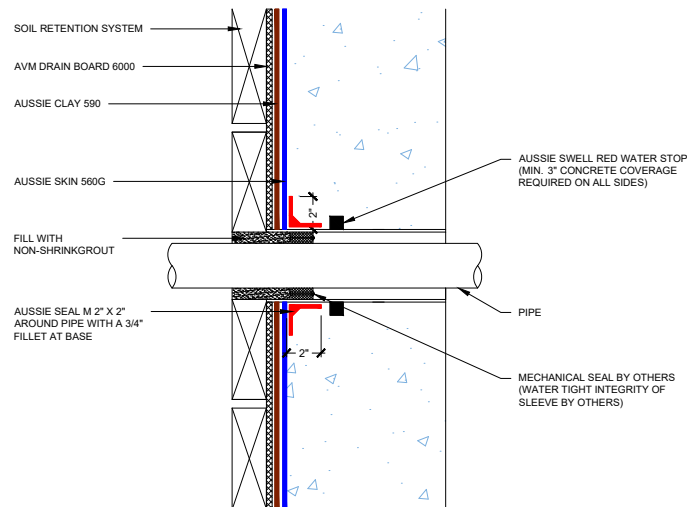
SLEEVED PIPE PENETRATION
